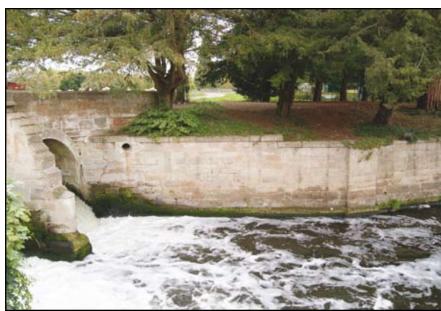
Abbey Mill Bridge, north wall to east of bridge
